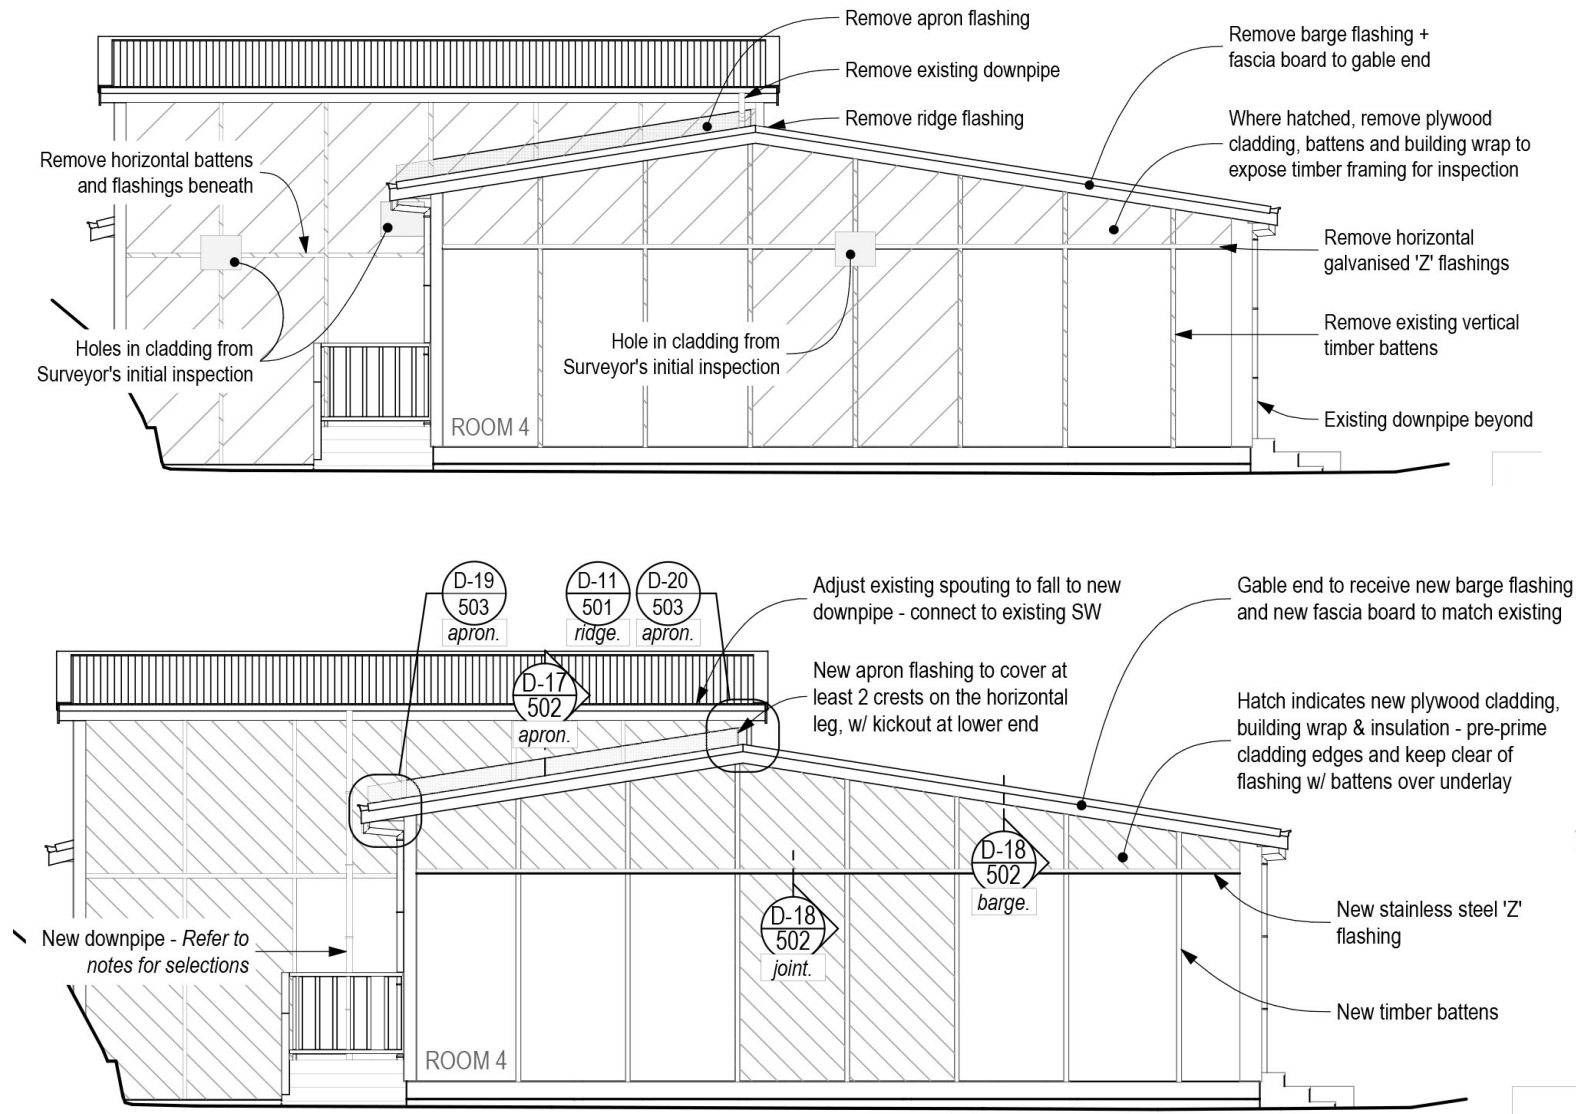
North Elevation existing and proposed works – refer 200 series Architectural drawings
